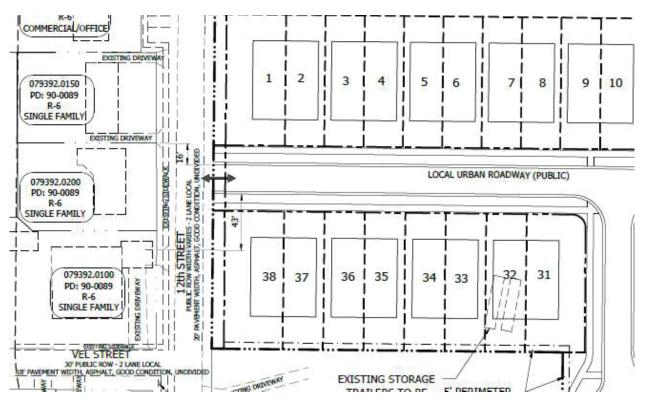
Excerpt of Site Plan with Proposed Entrance and Connection Spacing
